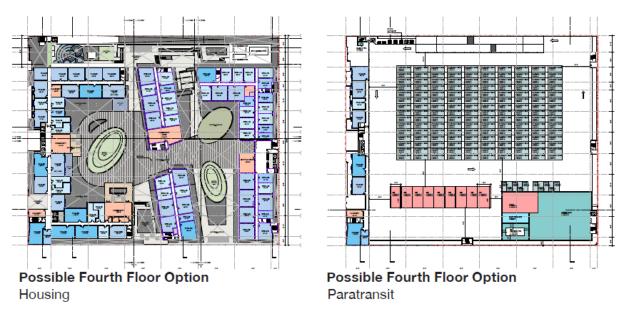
Potrero Yard – Modernization Project Schematic Plans (Fourth Floor Options)
